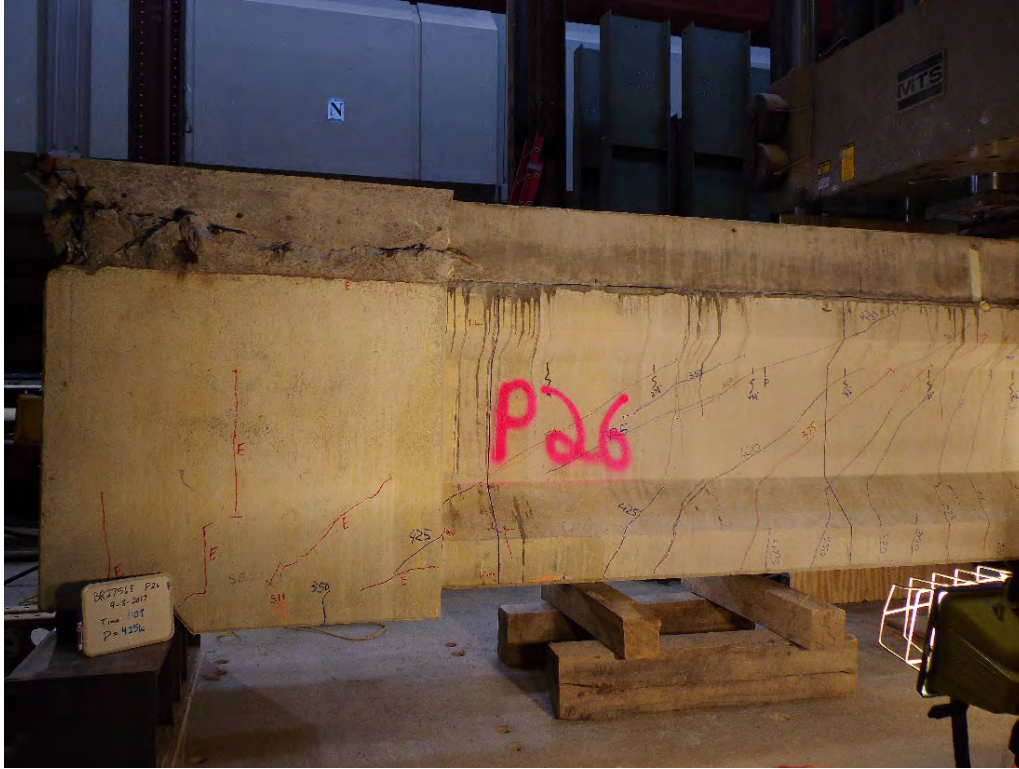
Girder P26 Southside Section 1-Section 3 $P=425$ kips
